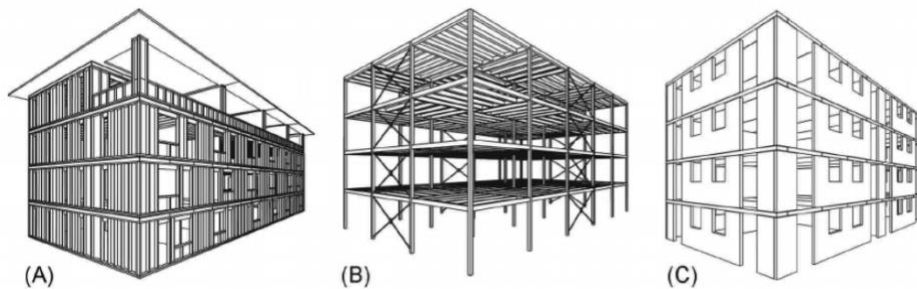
Common wood construction systems, including(A) light frame (B) mass timber post and beam (C) mass timber panels (Kuzman and Sandberg 2017).
